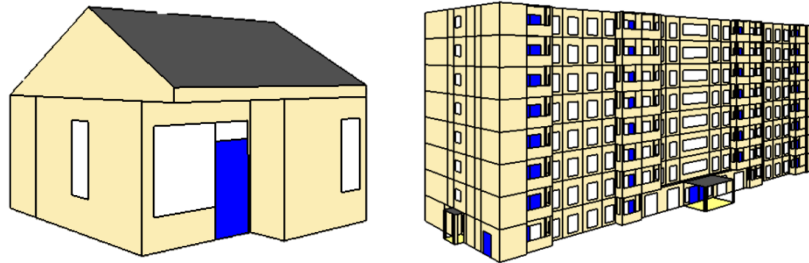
single-detached house (left) and eight-story vertical housing unit (right)
